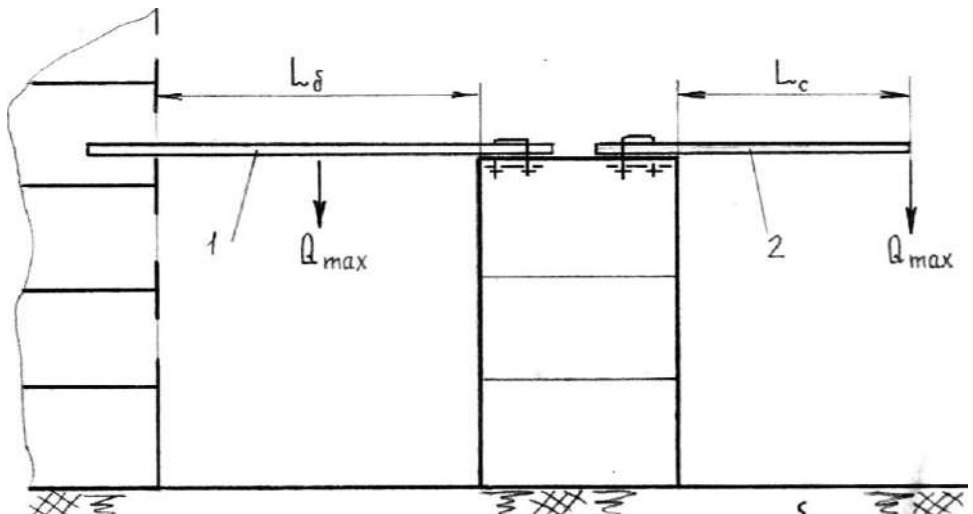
Layout of the mounting beam (a) and cantilever fixed boom (b): 1 – two-support beam; 2 – cantilever fixed boom.
